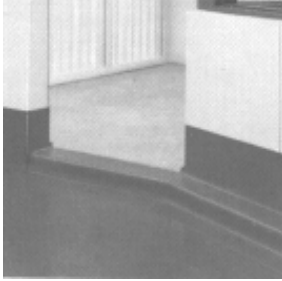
Heat welded Contrasting Color With Matching Weld Rod
